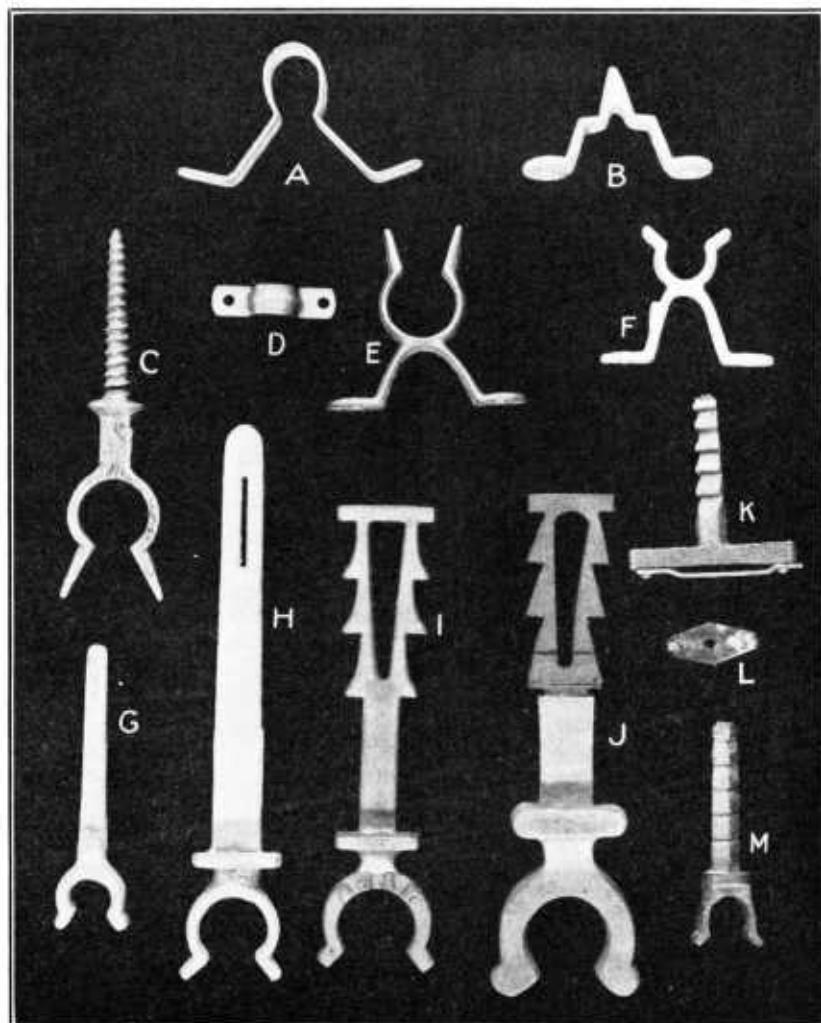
Conductor fasteners: A, loop fastener for cable, also used for star-section rod; B, for star-section steel rod laid flat on surface of building; C, screw fastener for cable, also used for star-section rod; D, clip for cable laid flat on surface; E and F, "disperser" attachments for rod and cable; G, H, I, J, K, and N, various forms of fasteners used with cable and star-section rod adapted to masonry or concrete. J is a chimney fastener coated with lead to protect from corrosion. K is used with flat copper cable, as is also L, the latter being secured with copper nails. (See fig. 1, E.) A, B, D, E, and F are usually secured to the surface with galvanized nails, but screws would make a better job.
